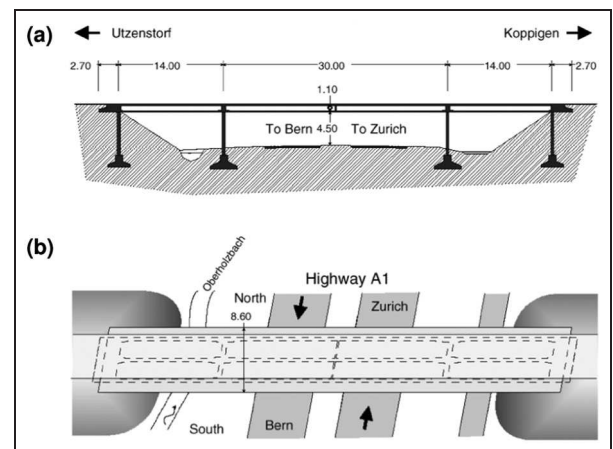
Longitudinal section (a) and top view (b) of the Z-24 Bridge.³⁷
